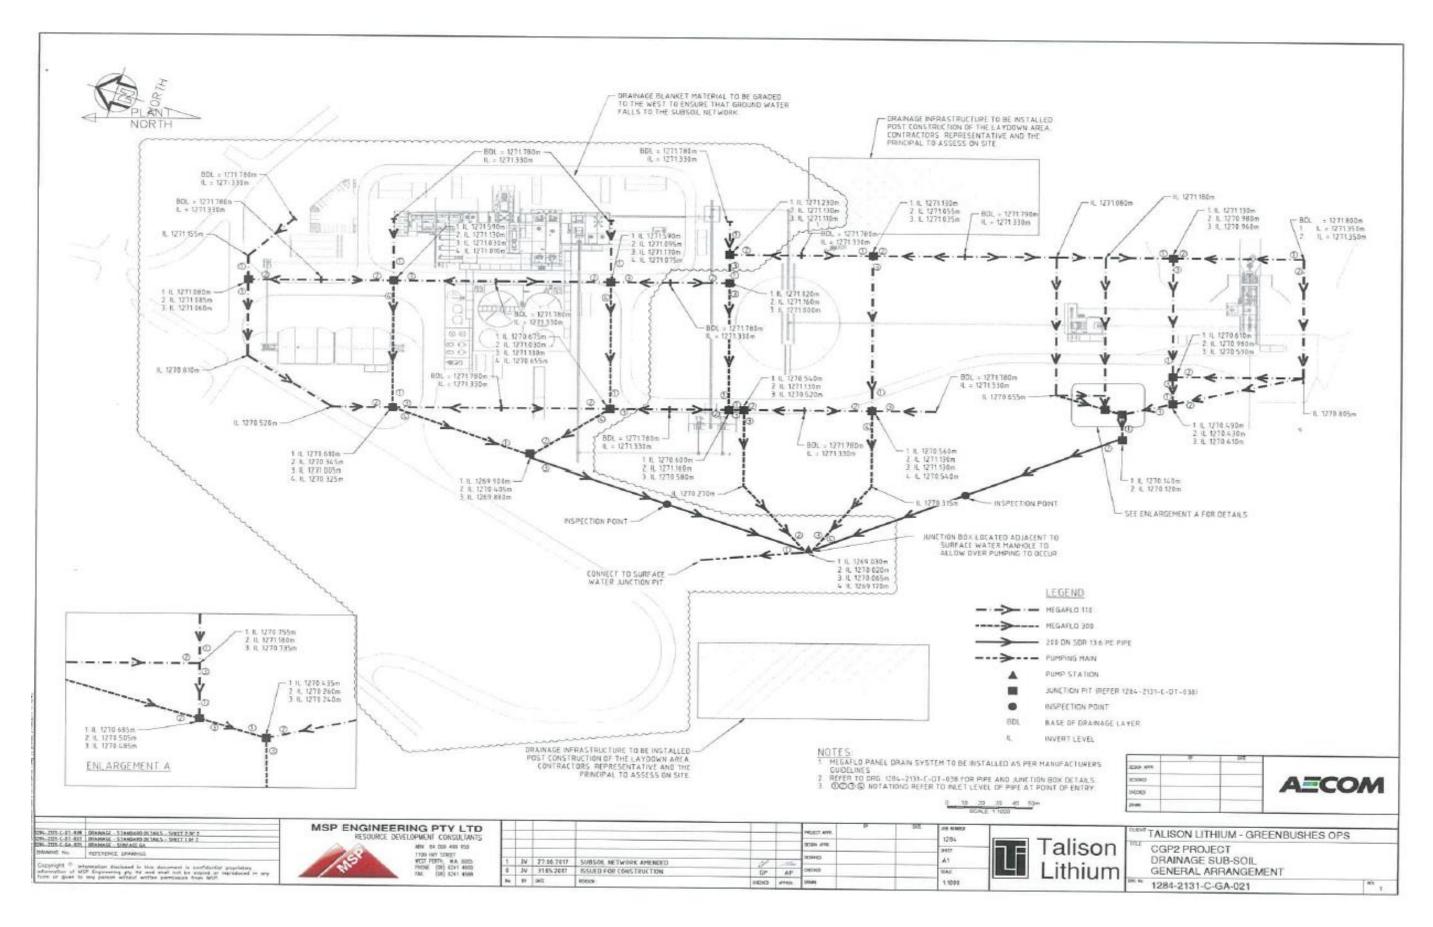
Subsurface stormwater drainage plan - Chemical Grade Processing Plant
